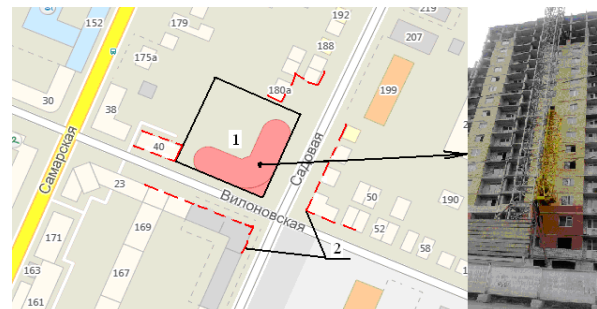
The scheme of construction site №1: 1 – the construction site, 2 – borders of a residential area
